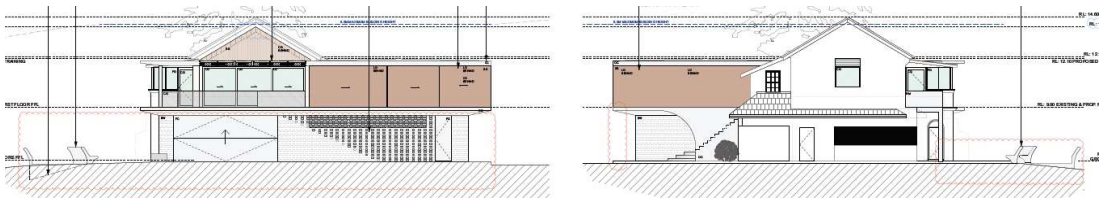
Northern and southern elevations respectively. (Source: Andriano Pupilli Architect)
